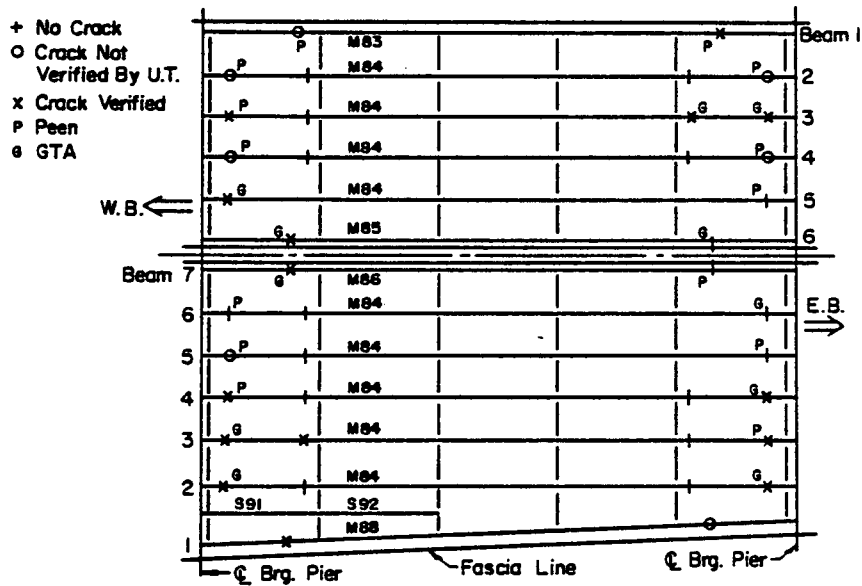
Repair Methods on Span 10, Yellow Mill Pond Bridge
